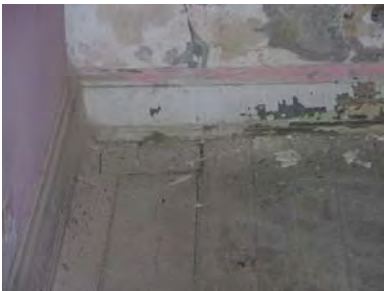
Floor and base damage at south west corner. (Photo: BBB, 2007)
